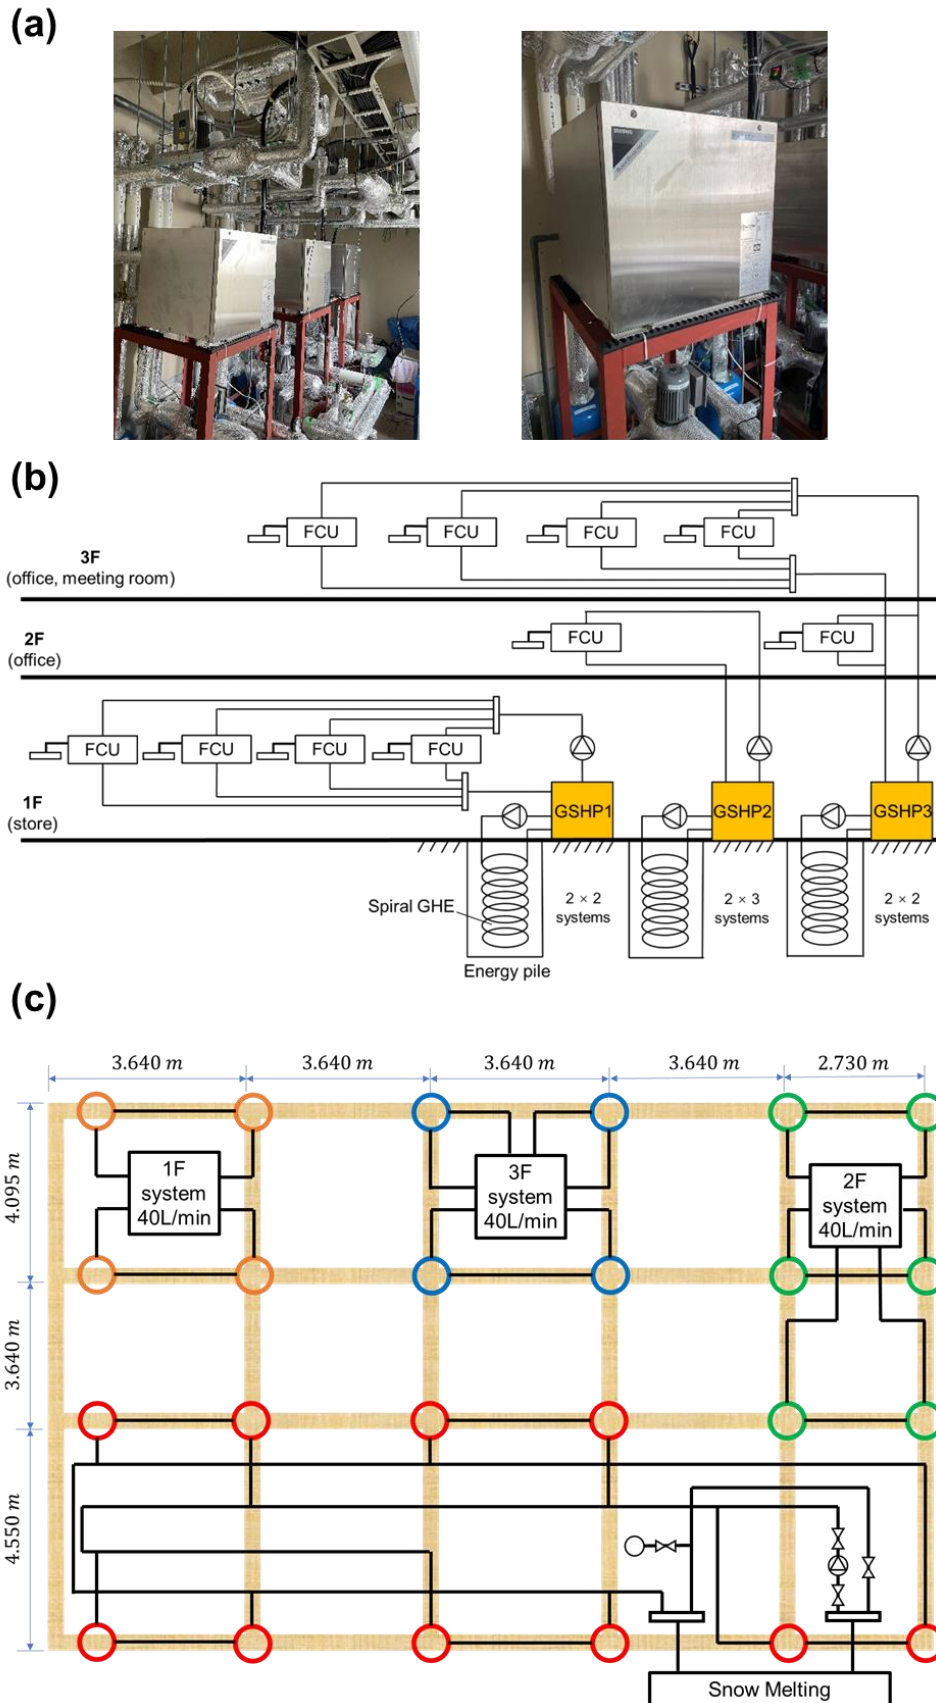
(a) Heat pump units on the first floor, (b) Schematic diagram of the 3-story house, (c) Layout diagram of thermal piles installed in the house
